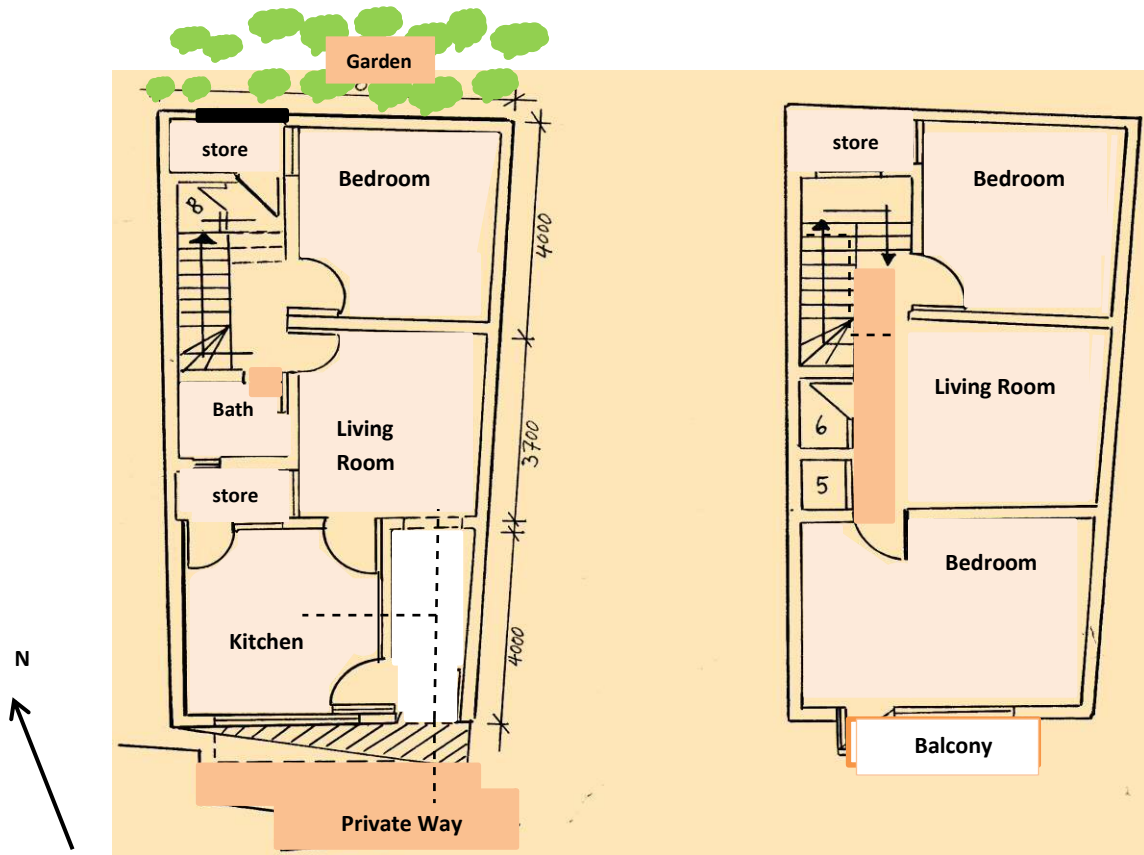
Ground floor level plan and first floor level plan of modern house No. 6. Scale: 1:100
